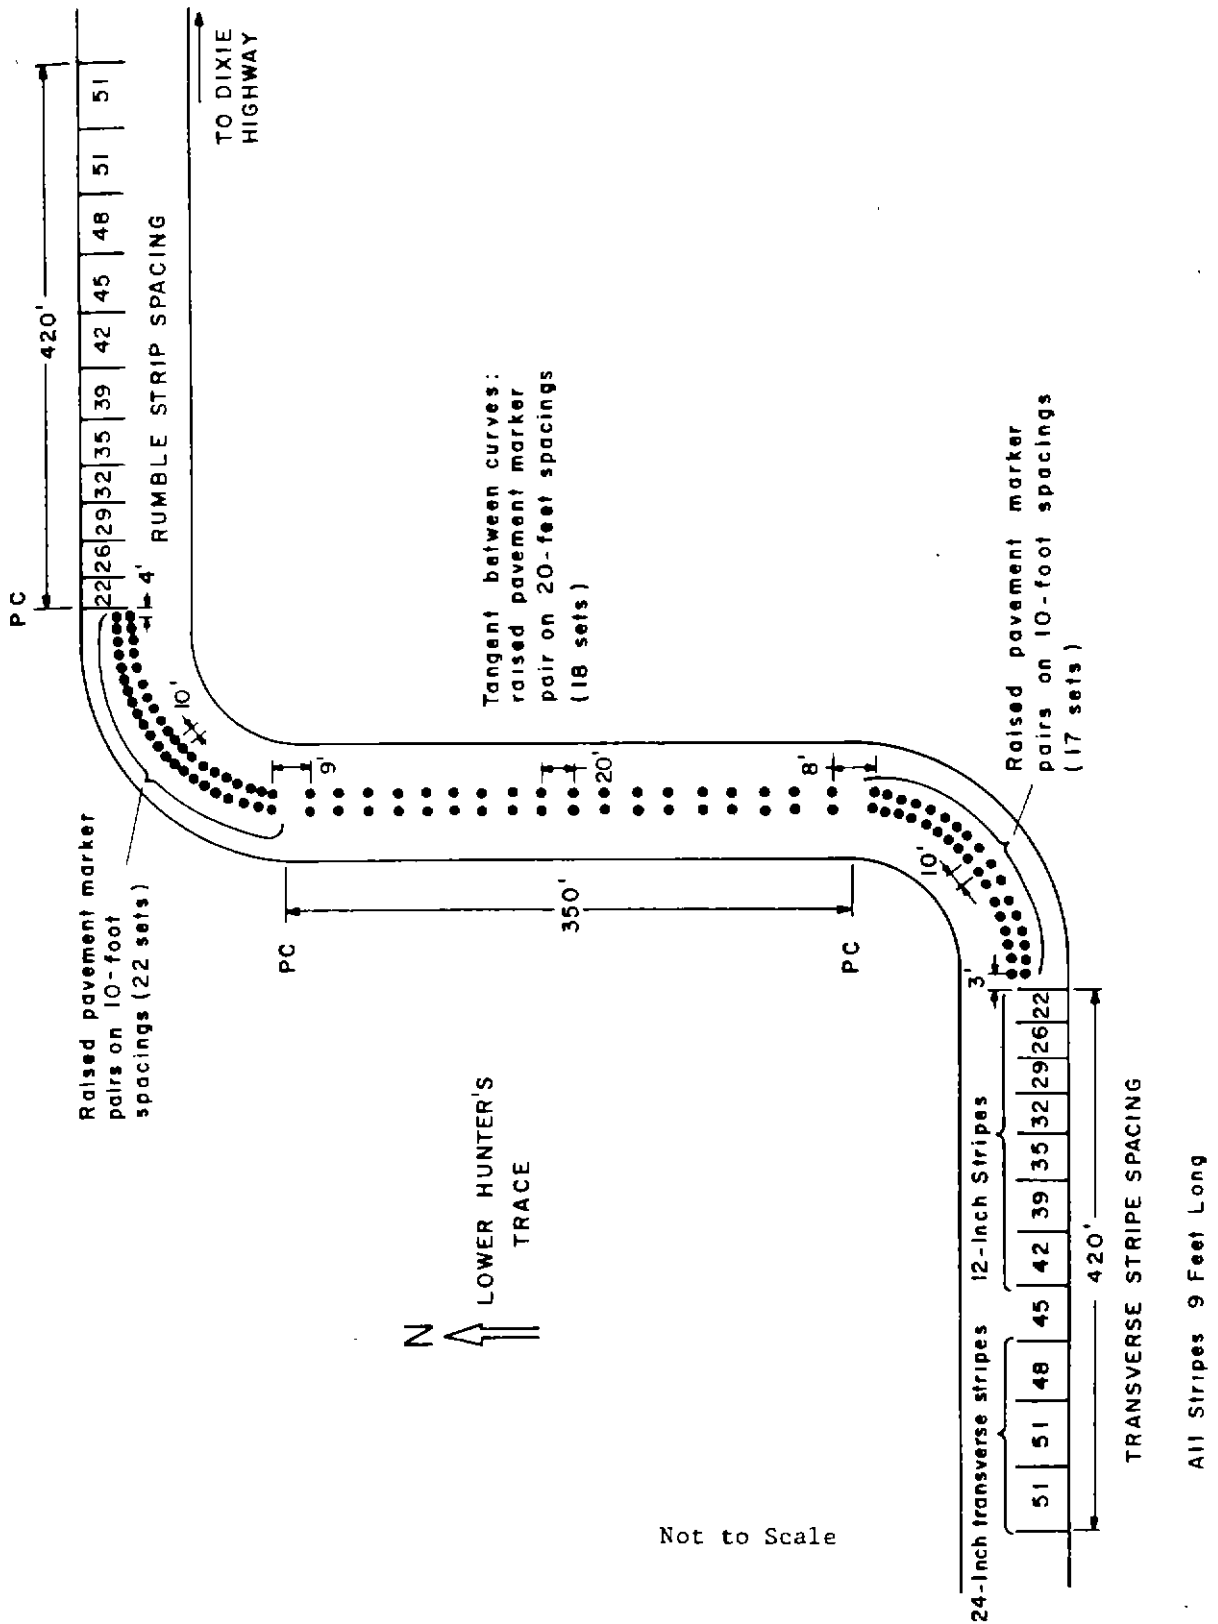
Sample road layout tested by Agent & Creasey (1986)
